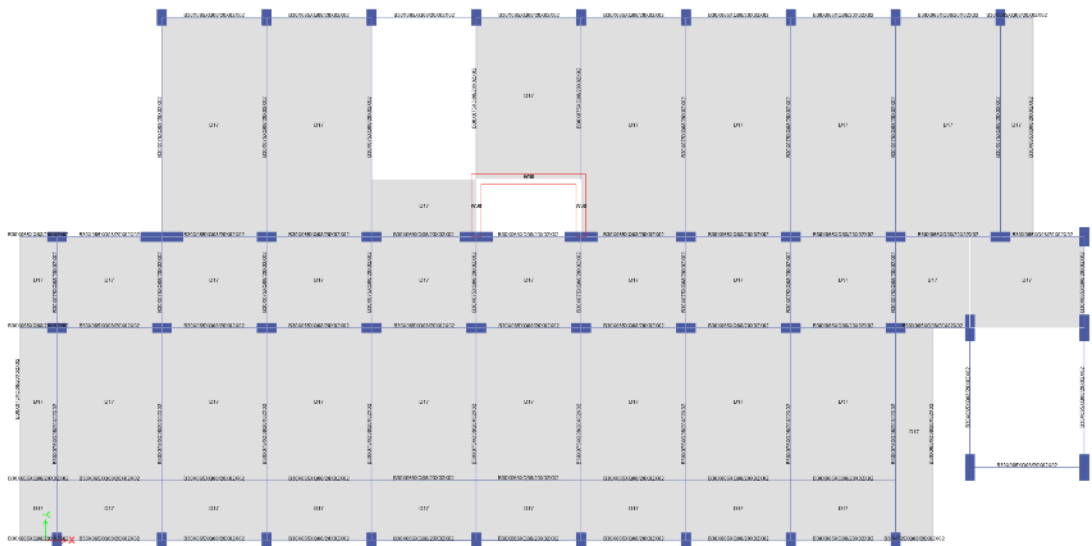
Formwork plan and element sections for the 3rd Floor and above.
